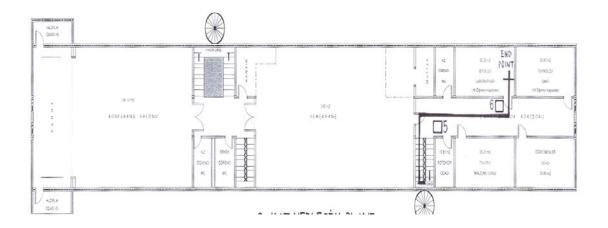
2nd Floor Plan of the high school building with selected route
